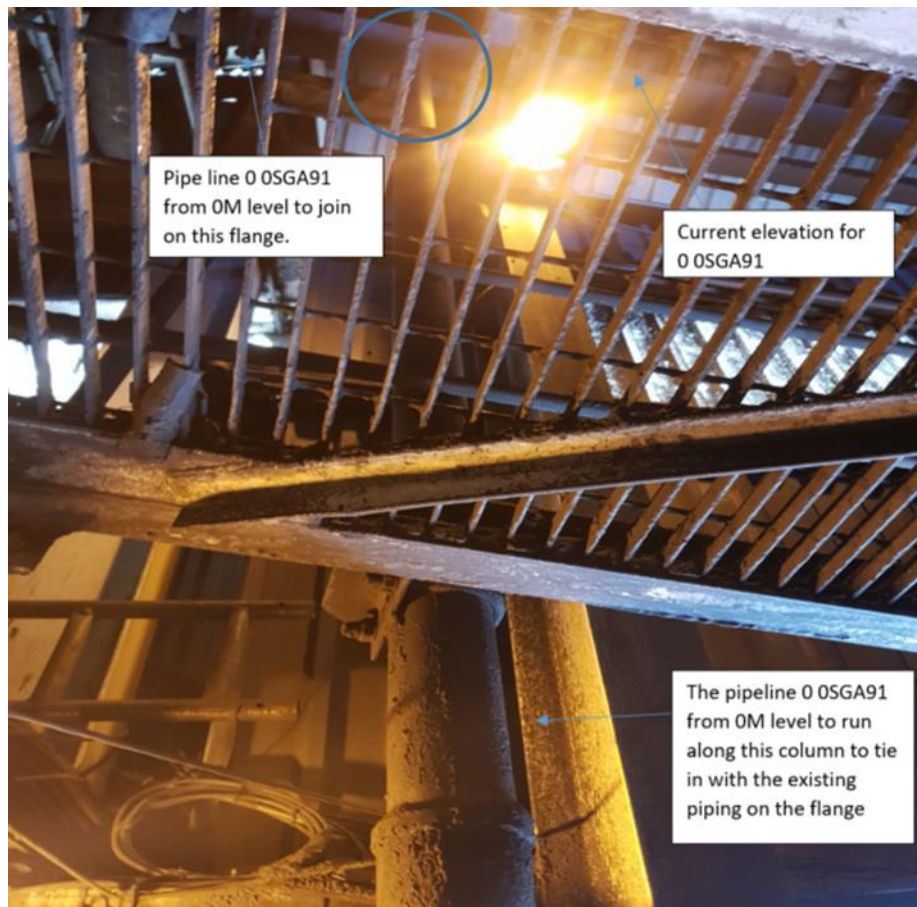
Existing Fire reticulation to be re-routed at Sizing Complex.
